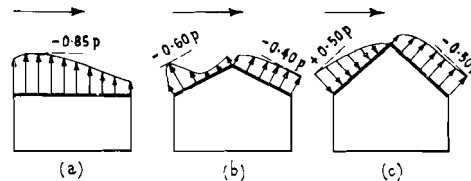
External pressures and suctions on roofs, with wind normal to eaves for (a) flat roof, (b) $23\frac{1}{2}^\circ$ roof pitch and (c) 45° roof pitch.
